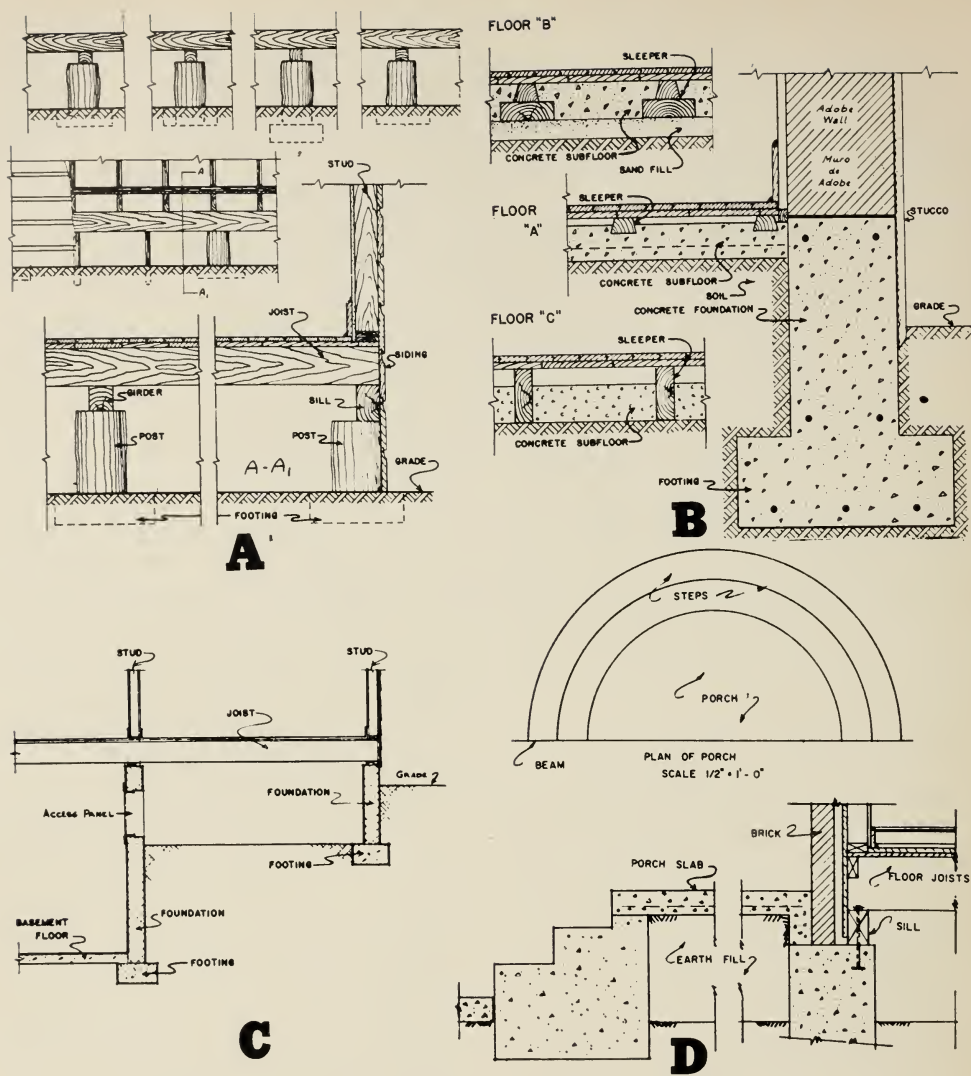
Types of construction: A. frame building on wooden posts; B. adobe wall house with wooden floors on sleepers in concrete; C. partially excavated sun porch; D. semicircular earth-filled concrete porch on frame house, brick veneer. (From Heal, 1951.)
